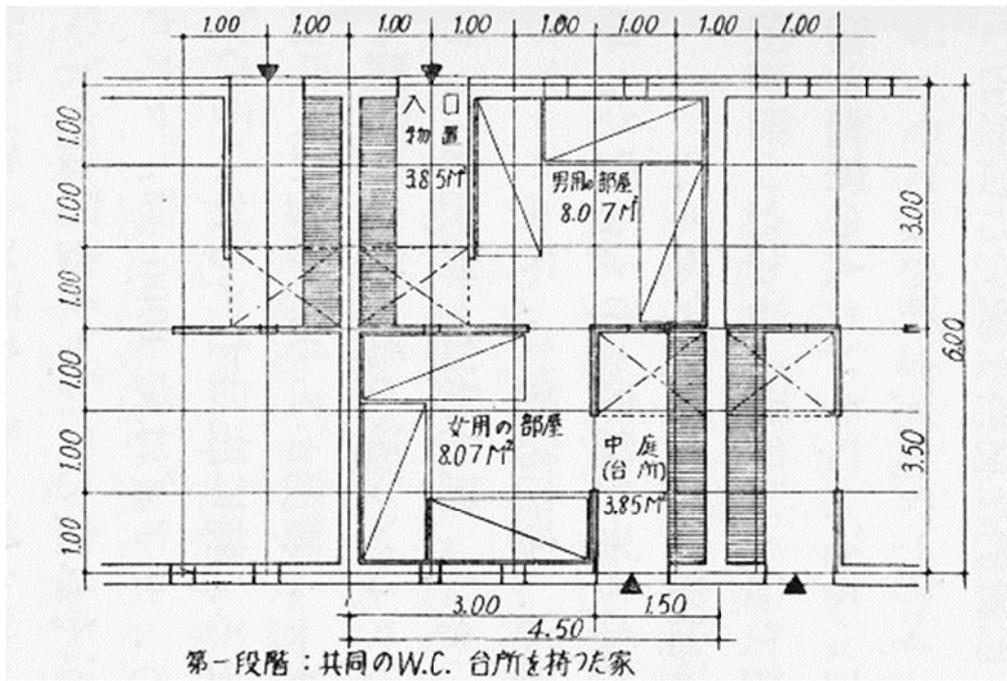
Floor Plan (first step) a house with a vacant patio or entrance.
